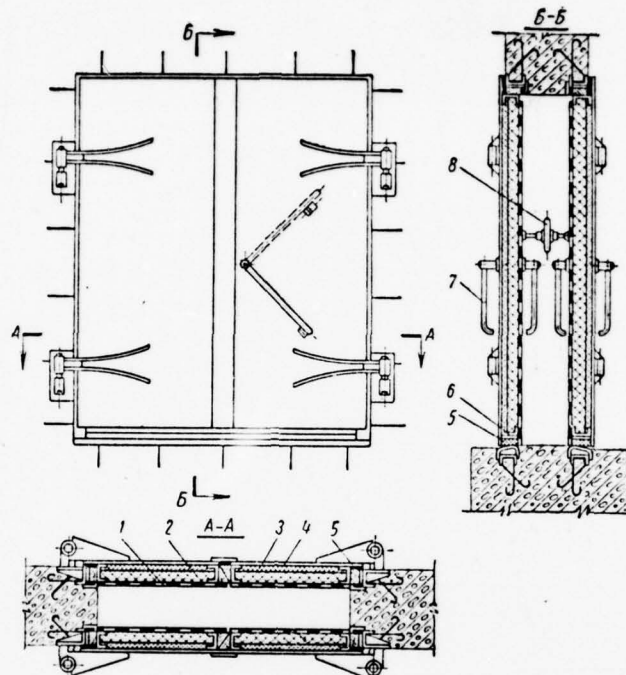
General view of construction of soundproofed gates: 1 - perforated/punched steel plate or wire gauze; 2 - slag cotton or fiberglass; 3 - layers of Ruberoid; 4 - steel plate; 5 - wooden beam with rubber gasket on entire perimeter of aperture; 6 - metal frame winch; 7 - knob/stick lever with wedge-shaped lock; 8 - tie piece cover for clamp of widths winch with spiral handwheel.
